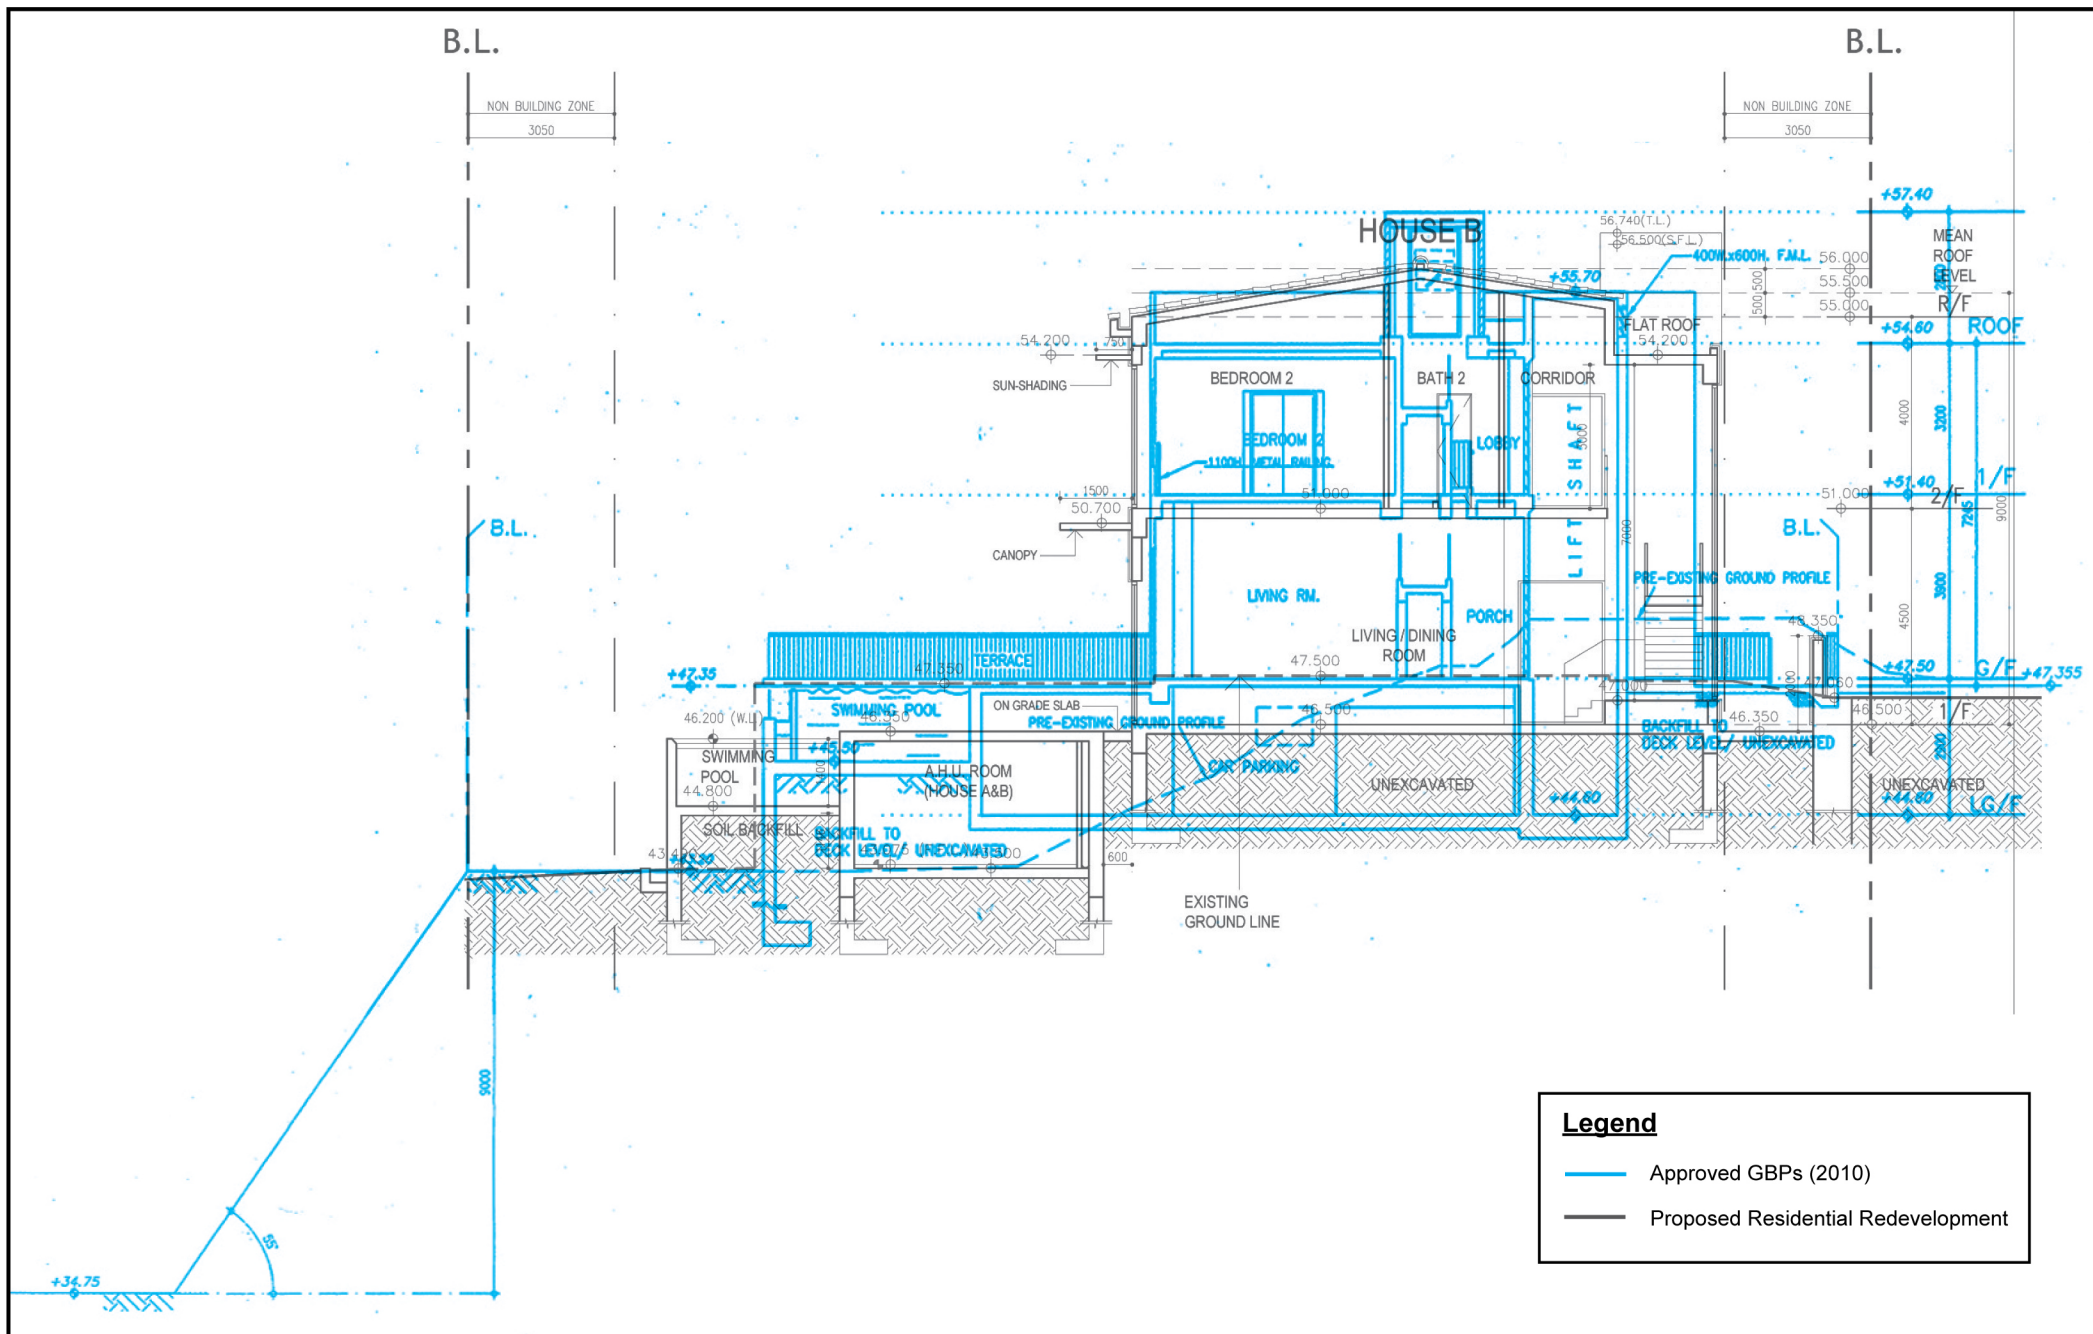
OVERLAY OF APPROVED GBPs AND CURRENT MASTER LAYOUT PLAN
